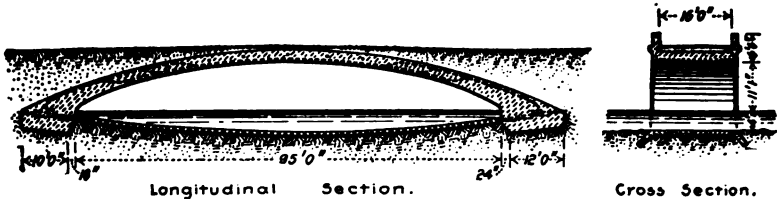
Lu'en Arch Bridge, Yorktown, Md.
